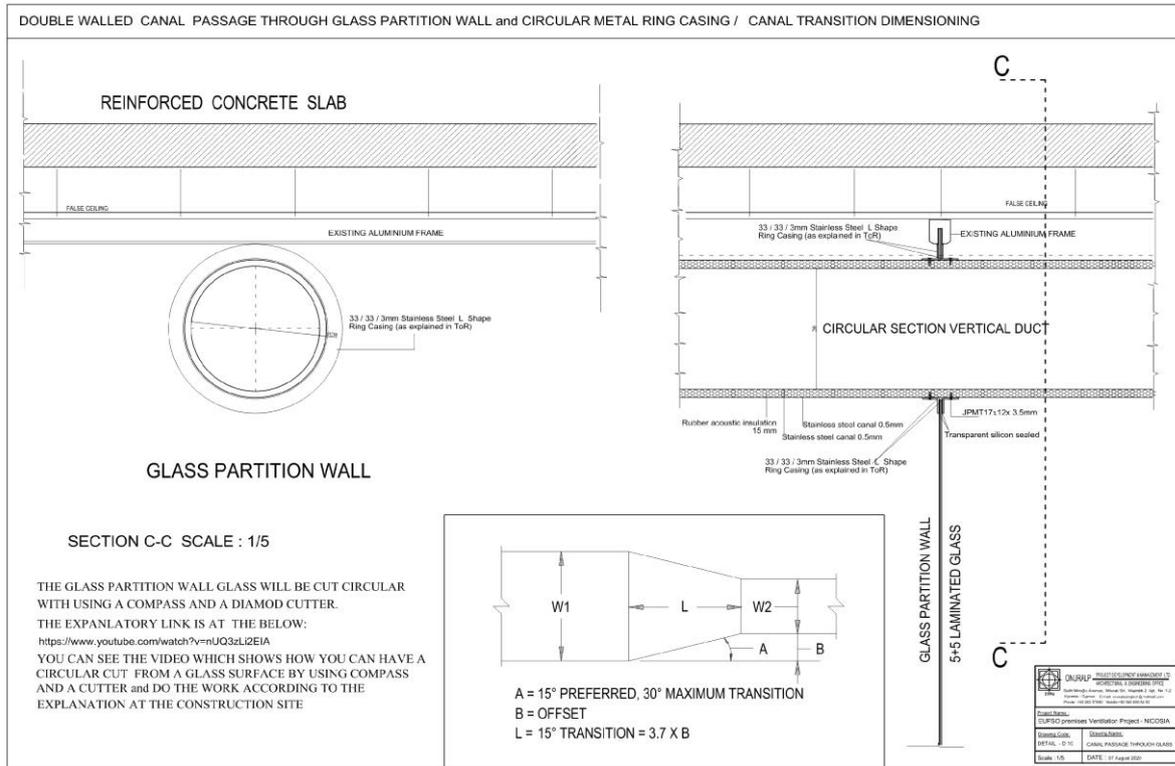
Passage through Glass partition wall – EUPS0 project detail no:10
